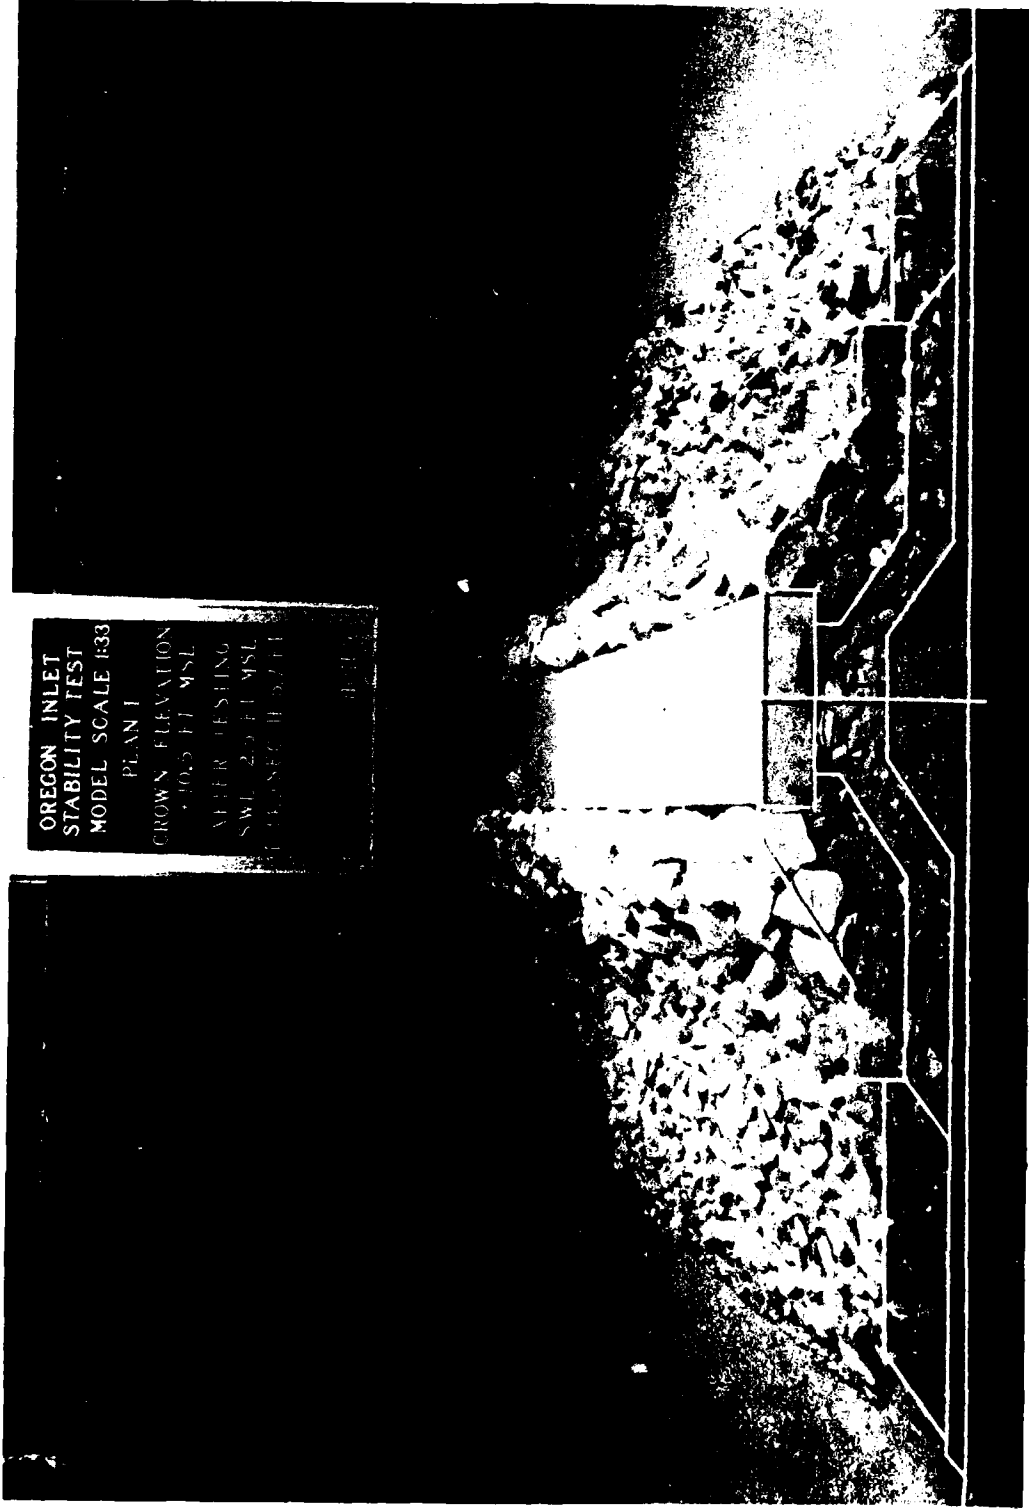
End view of Plan 1 after attack of 14-sec, 5.7-ft waves at an swl of -2.5 ft NGVD
